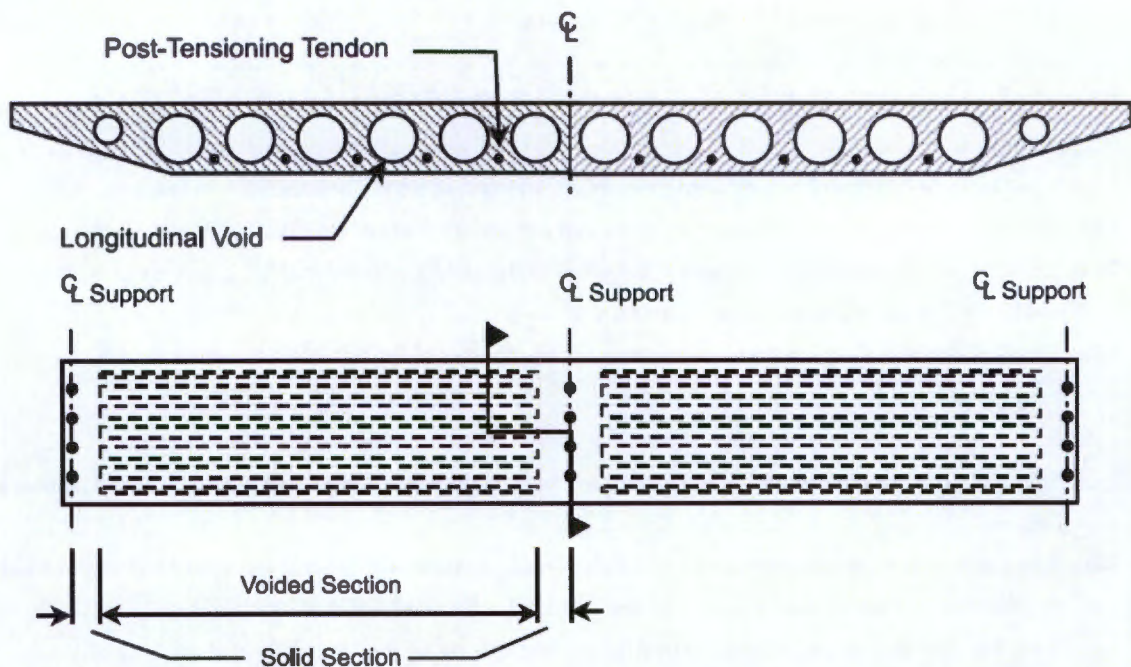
Typical cross-section and plan view of a voided slab bridge deck (Scollard & Bartlett, 2003).
